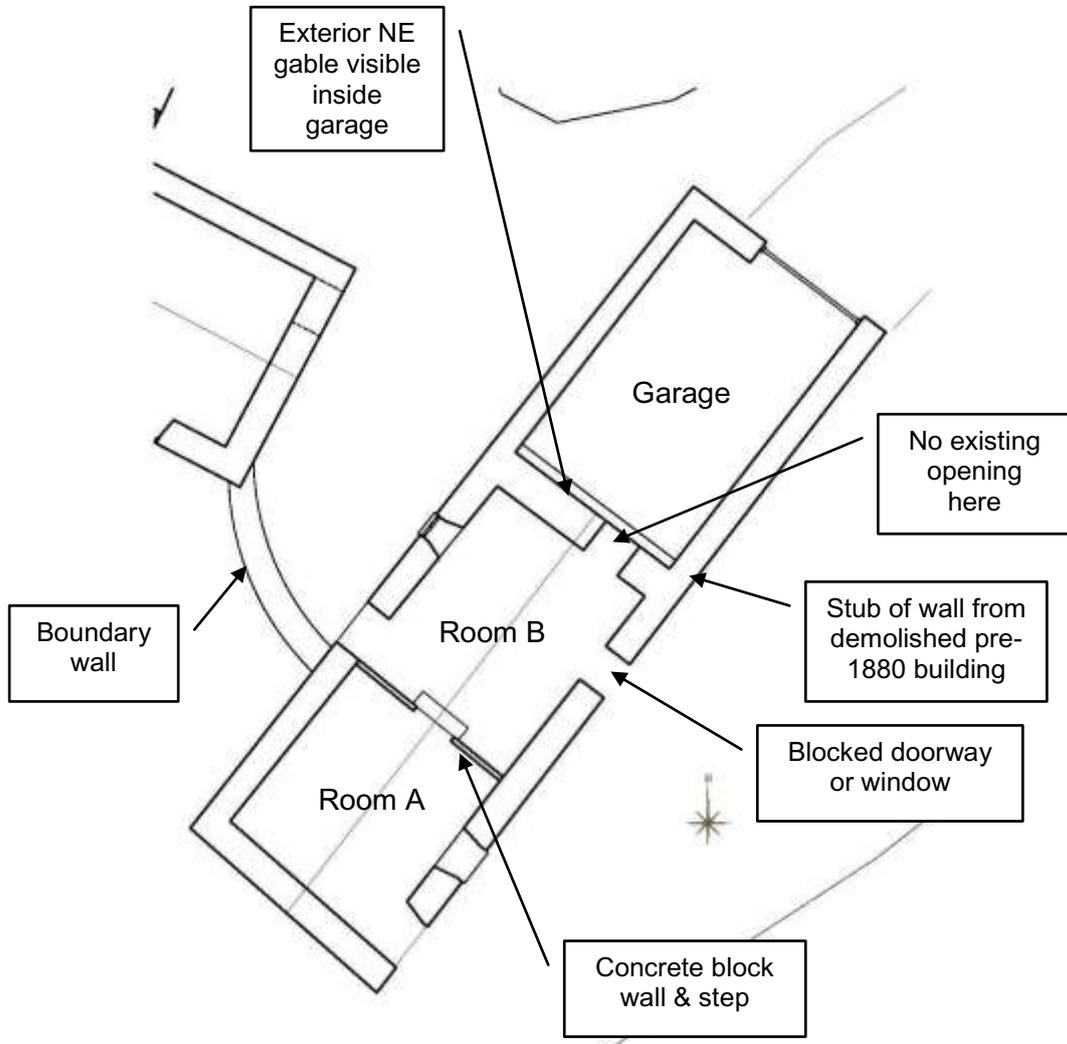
Plan of Barn 2 – 1:100 (Andy Travers, ATA Practice)
